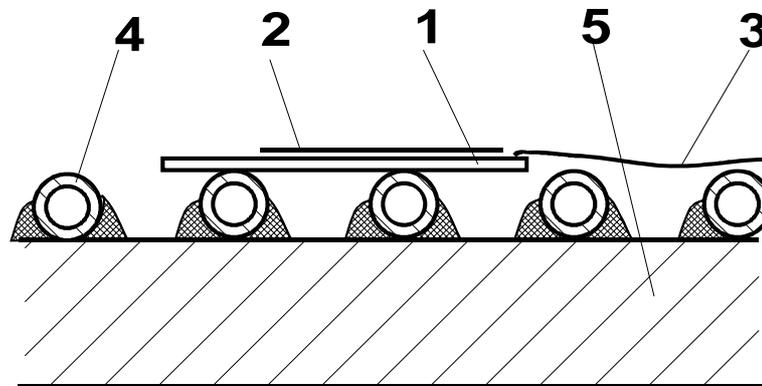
Arrangement of the dew point sensor inside the open ceiling cavity
